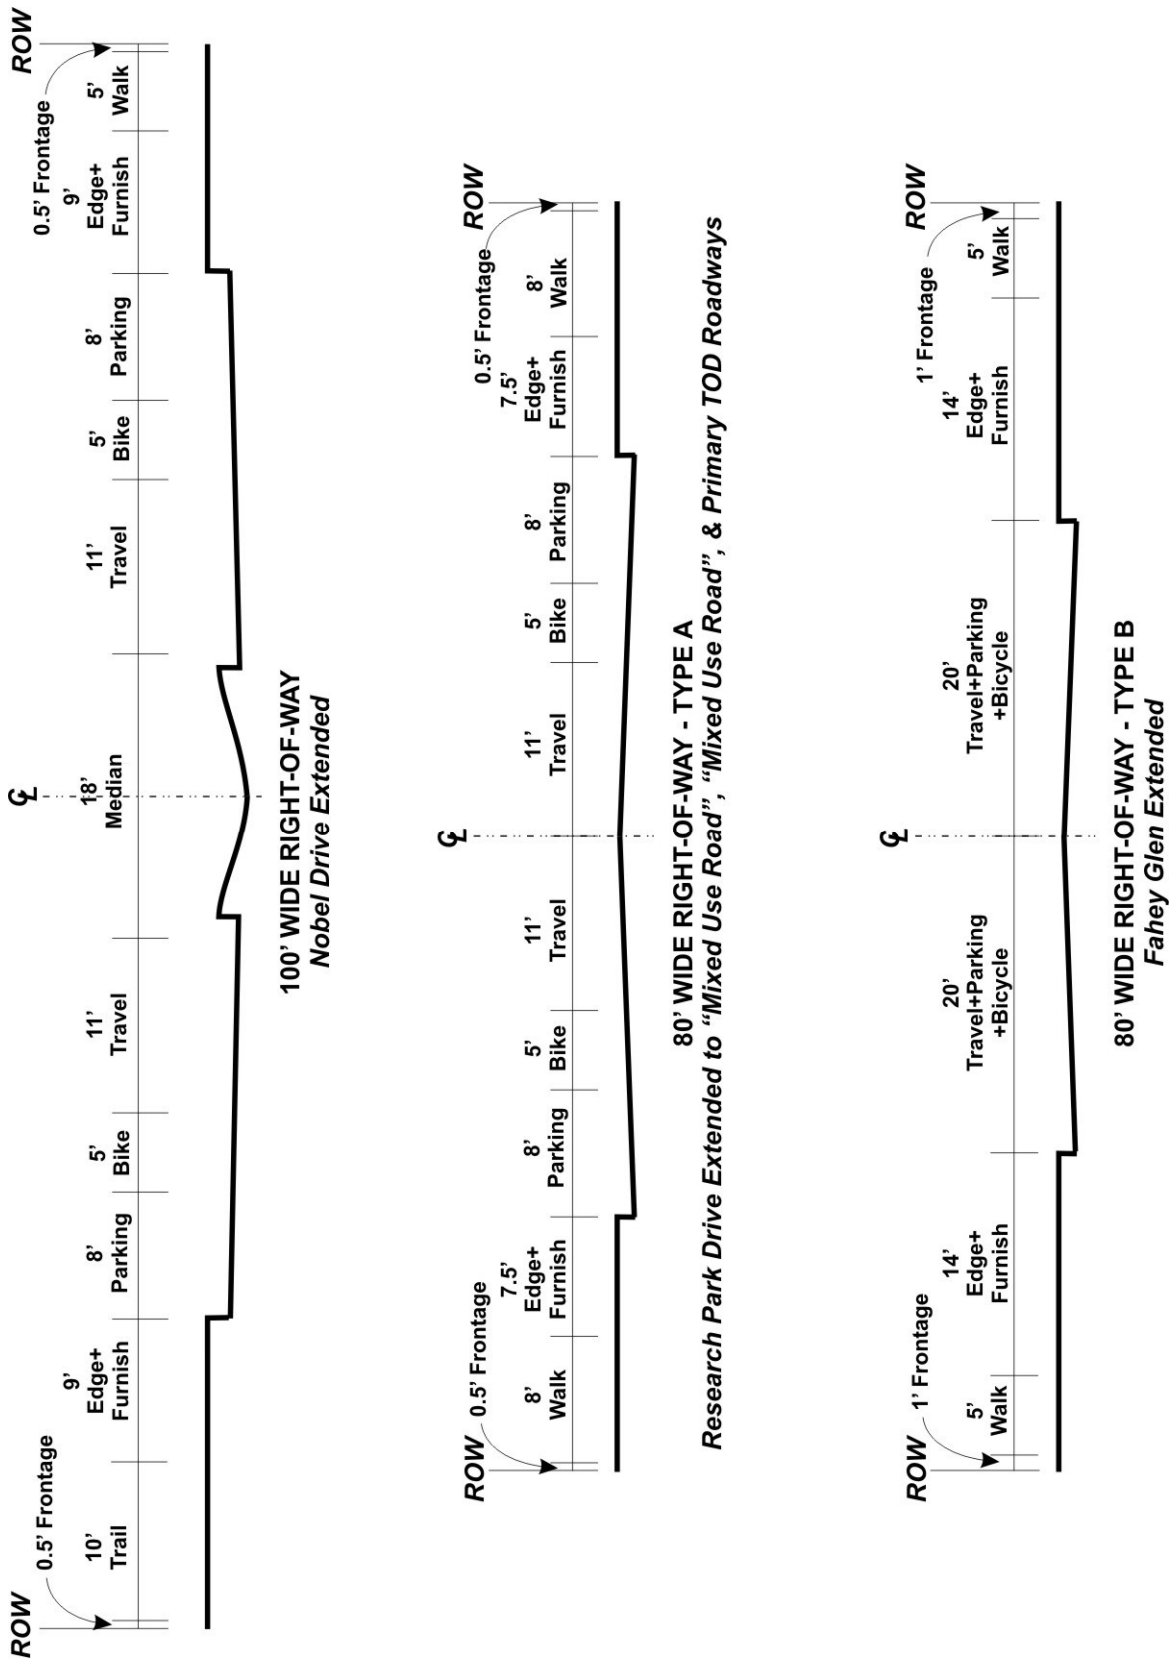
100-foot ROW, 80-foot ROW Type A & 80-foot ROW Type B Cross-Sections
